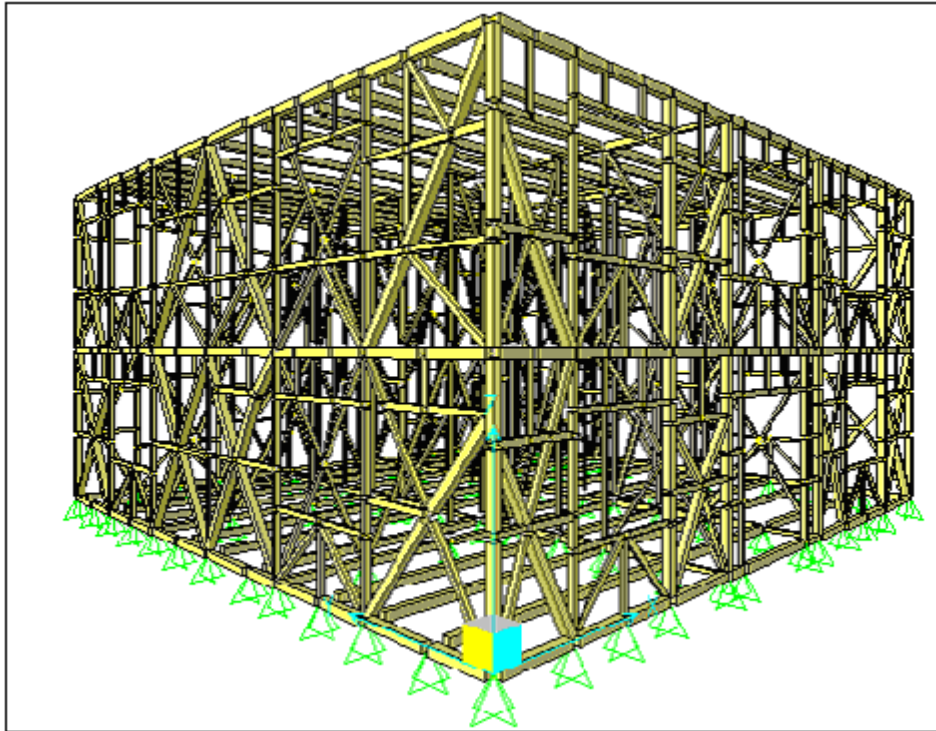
Undeformed Shape of Hımiş Structure With Infill Material
